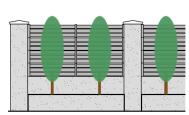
Non-permeable fencing – rendered masonry pier and low wall with integrated planter. Solid infill panel above
